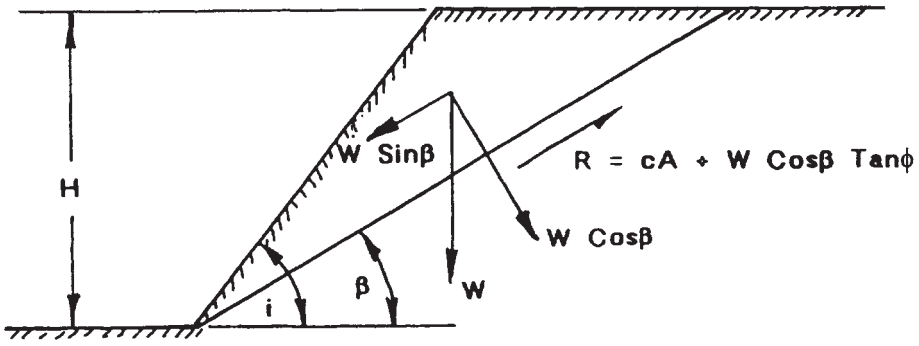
Dimensions and forces in a rock slope with a potential failure plane (Hoek, 1970a).
